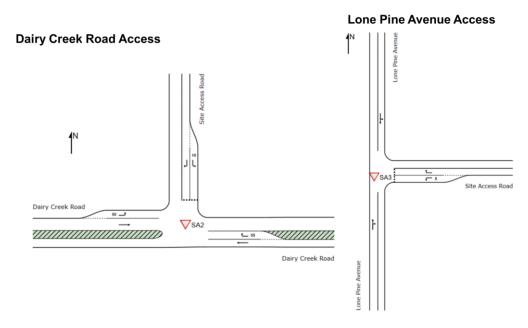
Dairy Creek Road and Lone Pine Avenue access layouts
